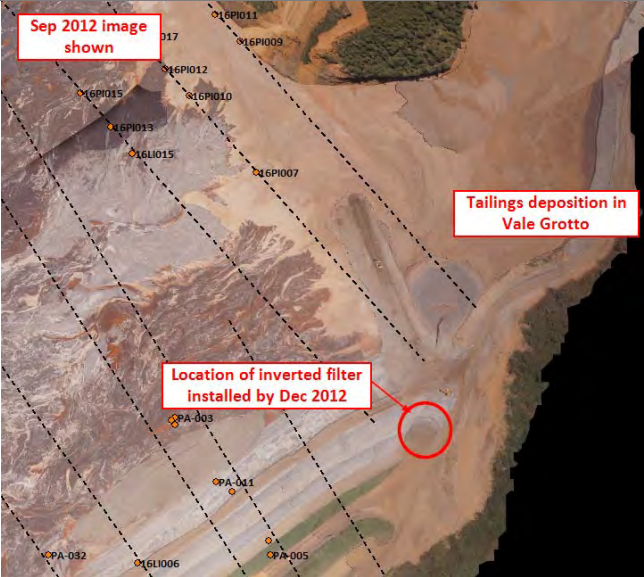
~ Performance of an inverted drain ~ Dike 1 heightening, left abutment.
